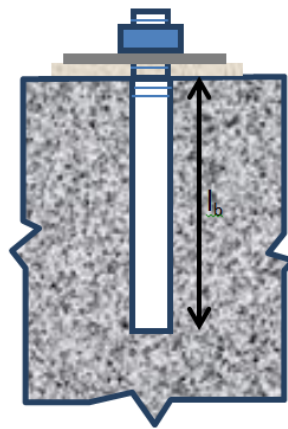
Cast-in-place anchorage with straight stem.
